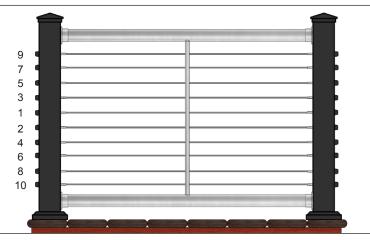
Figure N. Begin with the center run of cable and alternate working above and below until all the cables are tight.
